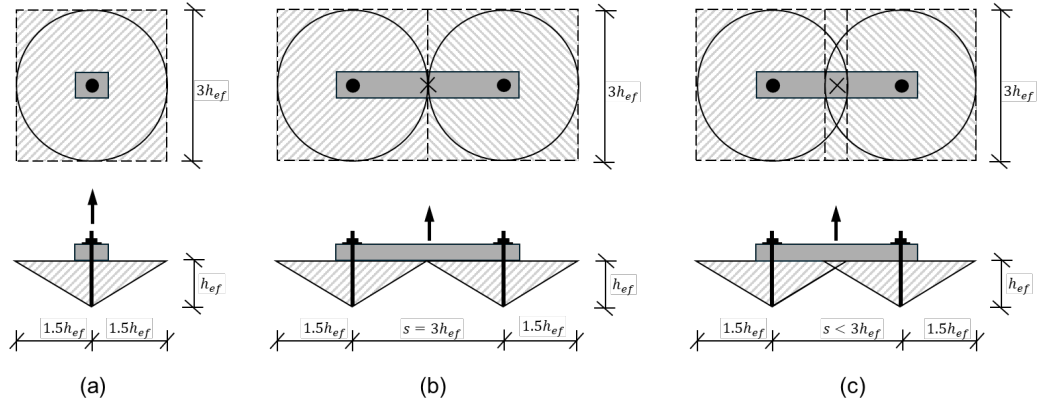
Idealized concrete cone failure surface of a tension loaded (a) single anchor, (b) anchor group with spacing $s = 3h_{ef}$, (c) anchor group with spacing $s < 3h_{ef}$.
